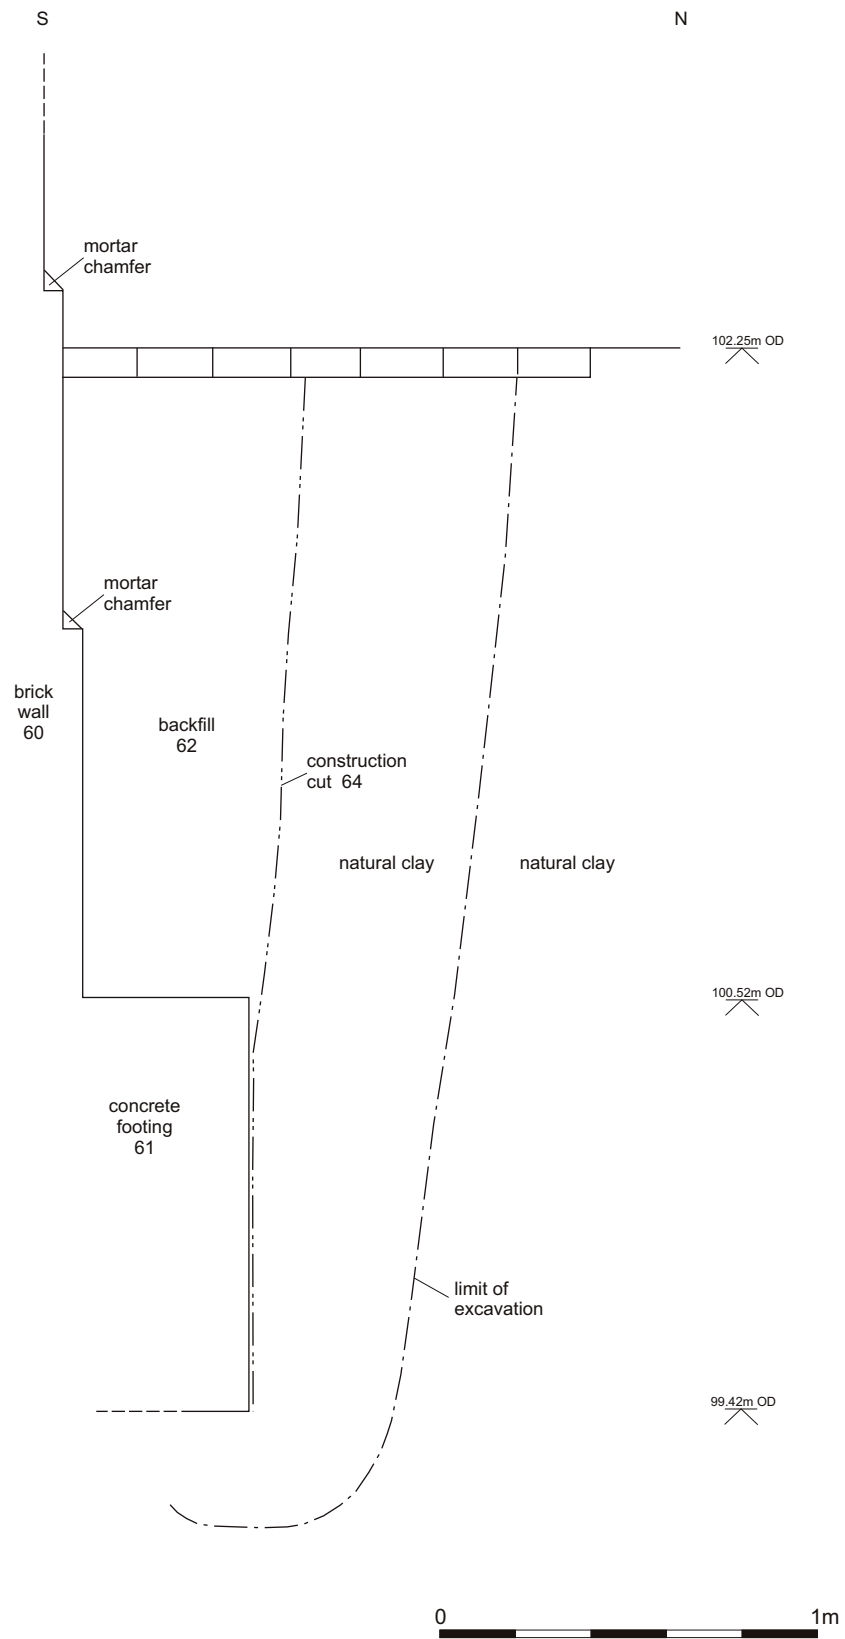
Test pit 11, section showing foundations of Brunel's South Water Tower
